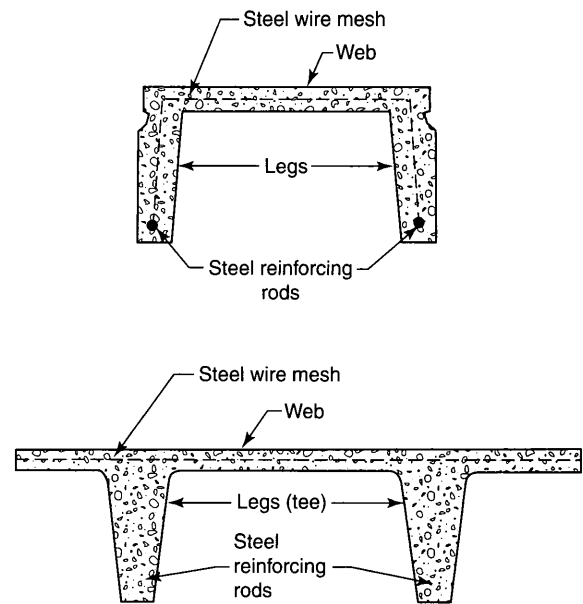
(a) Typical Concrete Tee Construction.
